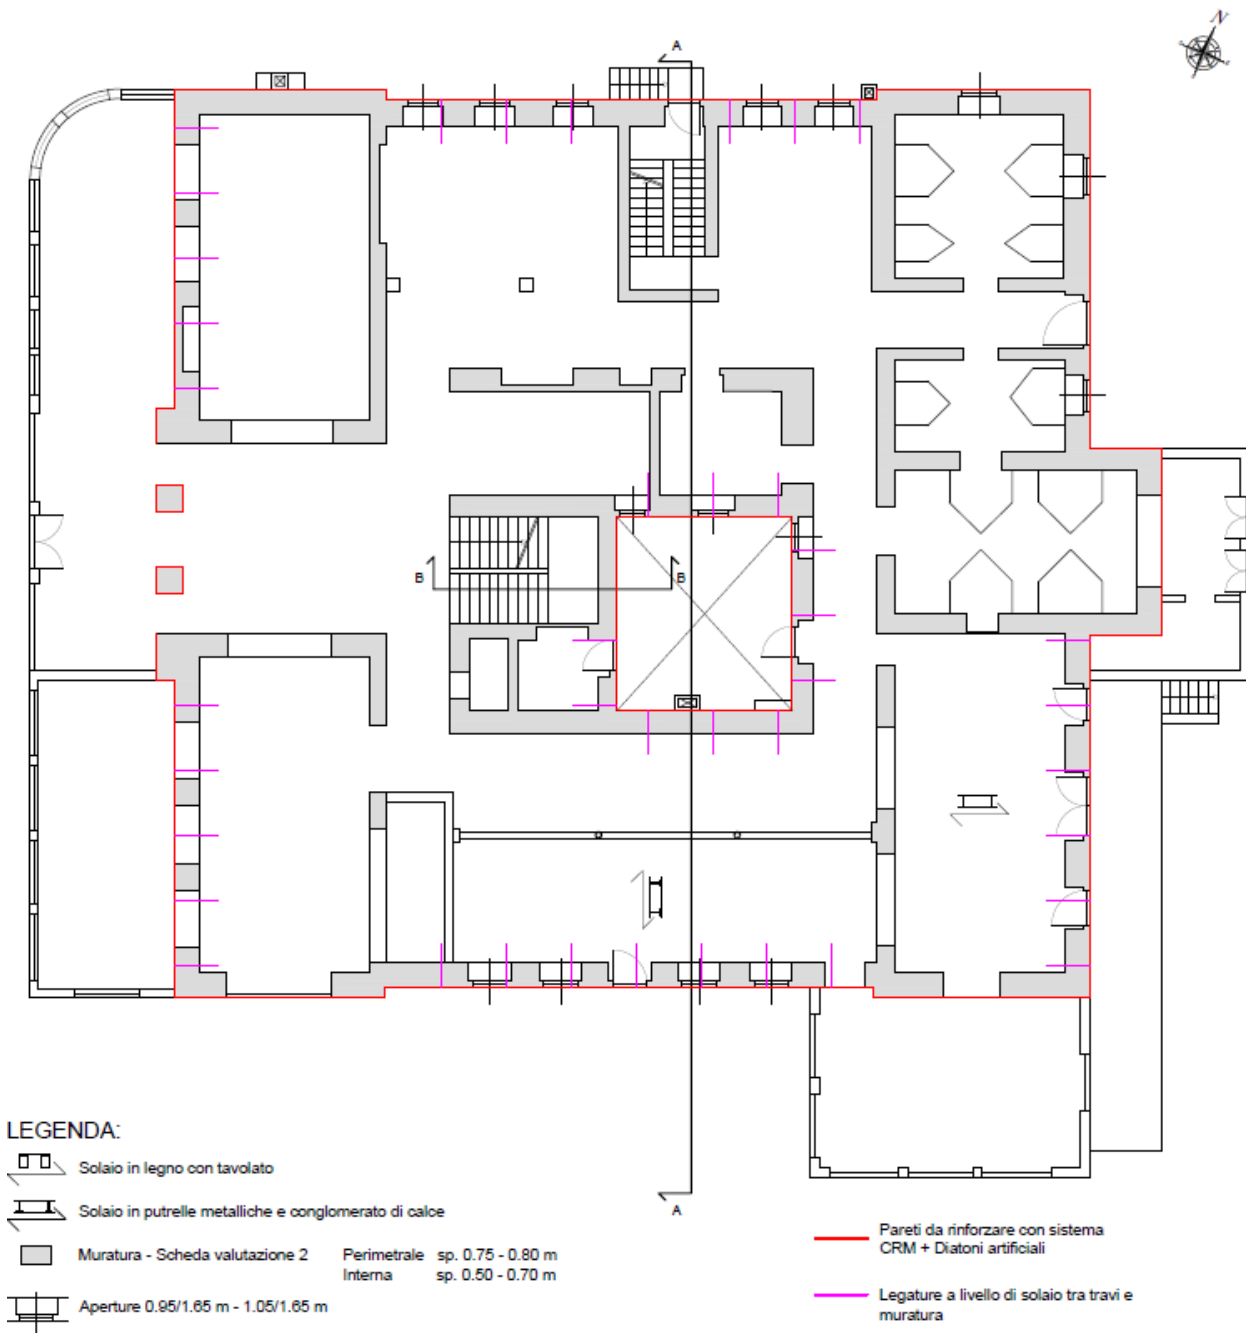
Floor plan - intervention R1 (red lines depict coating)
